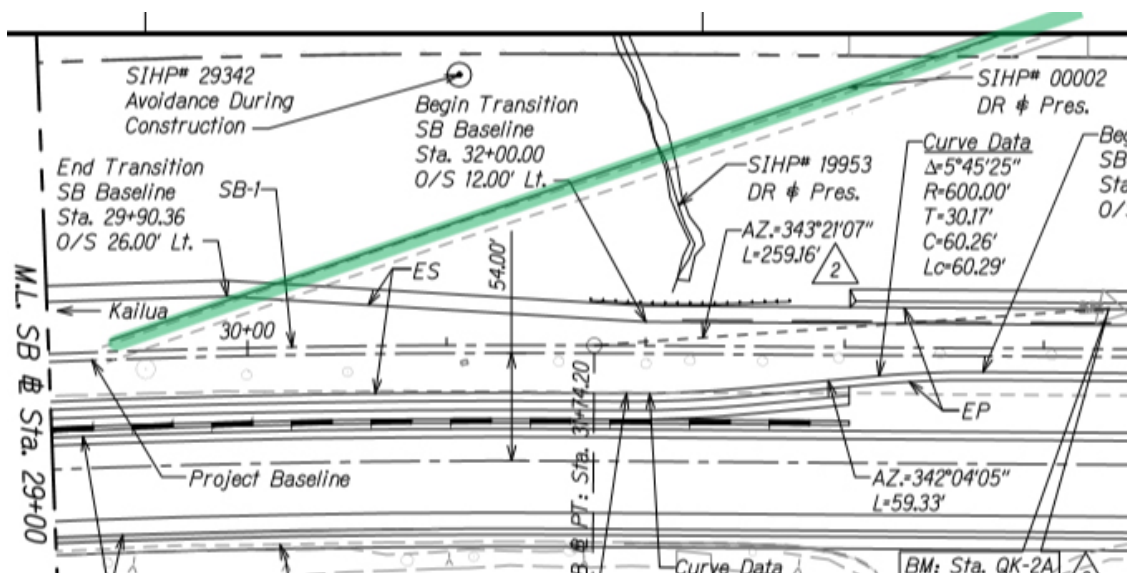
Māmalahoa Trail (SIHP #00002, highlighted in green) in Final Design Plans
